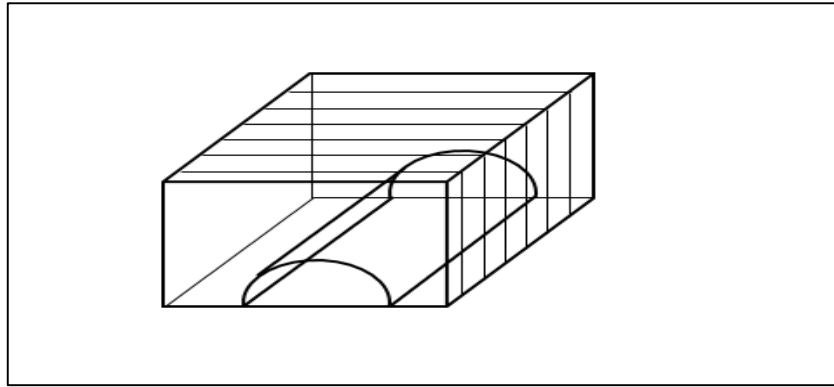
Joint strike parallel to tunnel. Dip 90°; Stress failure at $5.95 \times 10^6 \text{ N/m}^2$
